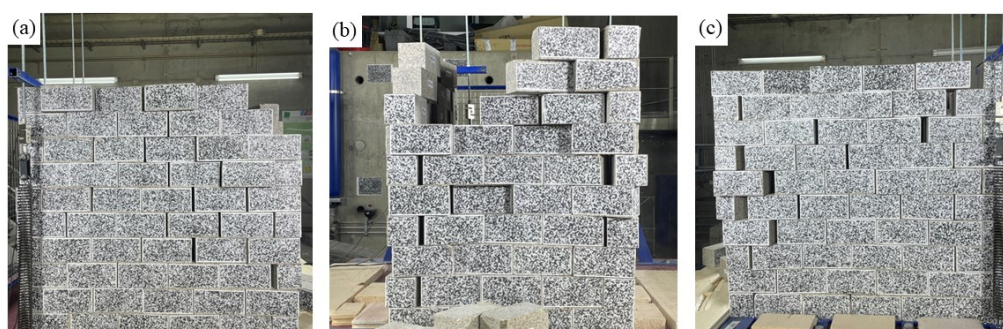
Observed collapse at 1.31 g: (a) top corner involved in collapse along with a wide diagonal crack in the west return wall, (b) Disintegration of the blocks in the façade, and (c) separation of interfaces with wide cracks in the east return wall.
